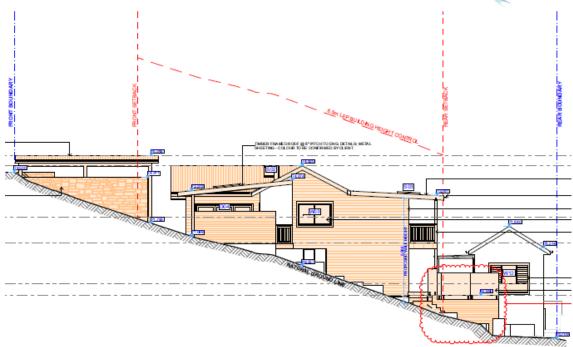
Extract of Proposed North / East Elevation (MOD08) – area to be modified shown in red bubble
